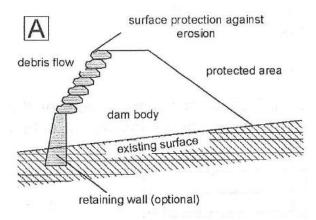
Schematic cross section of a deflection dam structure (sourced from Huebl & Suda, 2008).
